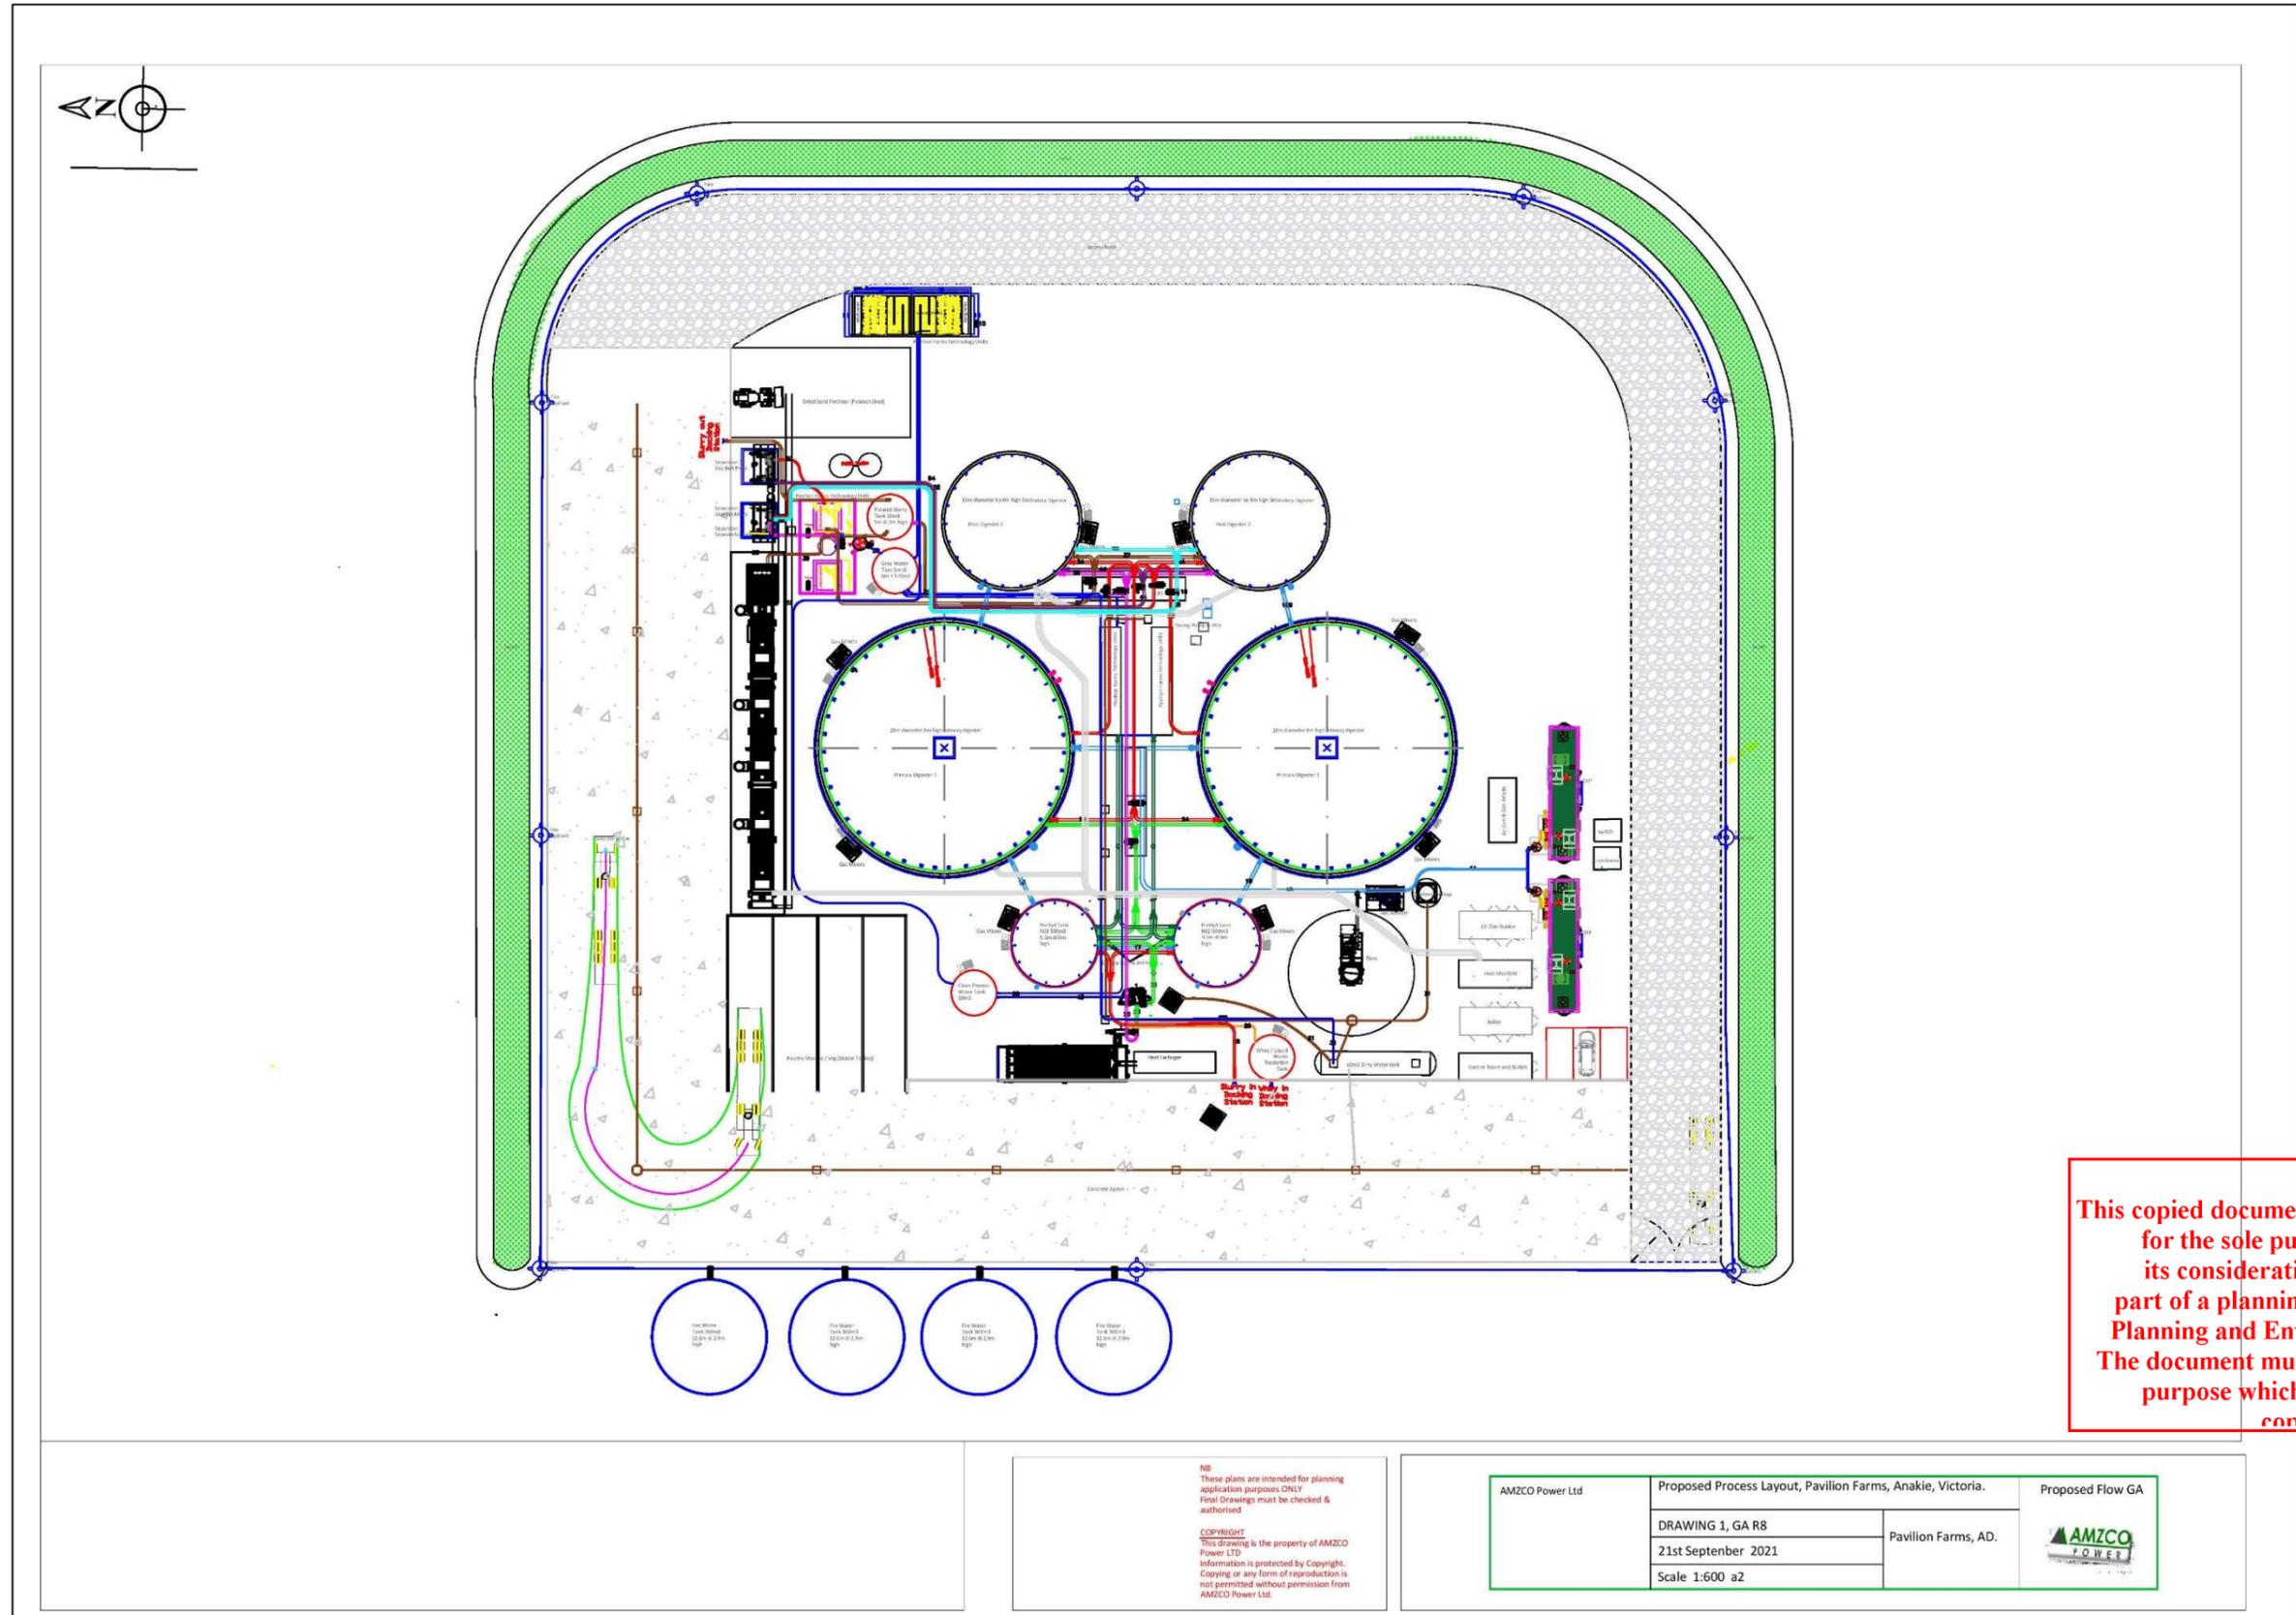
Overall site layout of the Proposed Fertiliser Facility
